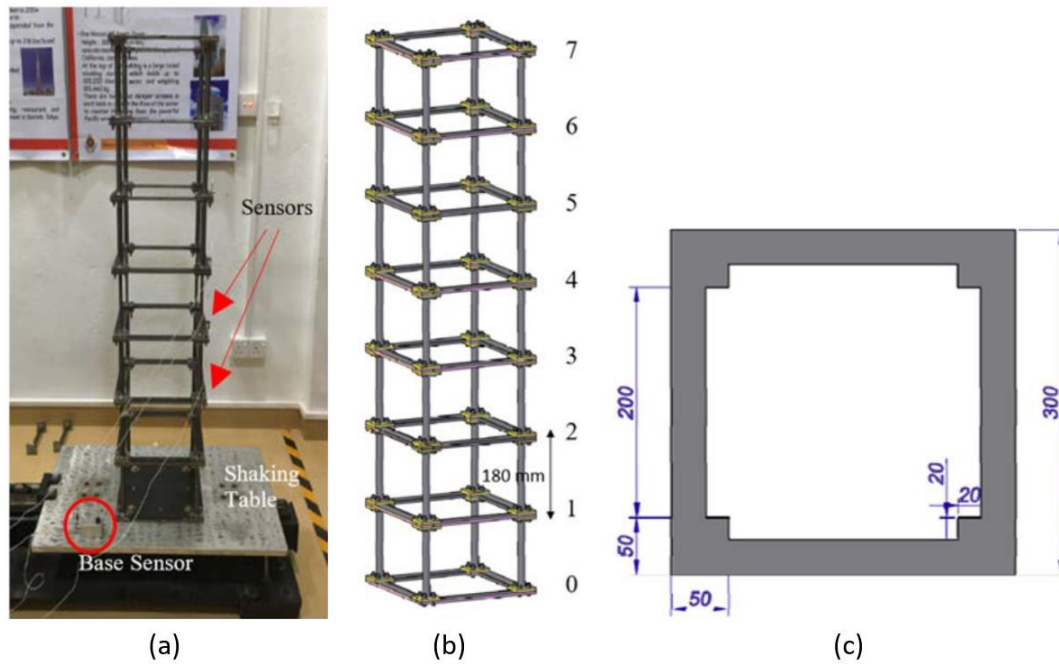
(a) Steel framed structure mounted on the shake table with sensor arrangement, (b) schematic diagram of the structure, and (c) dimensions of the steel beam arrangement [36]
